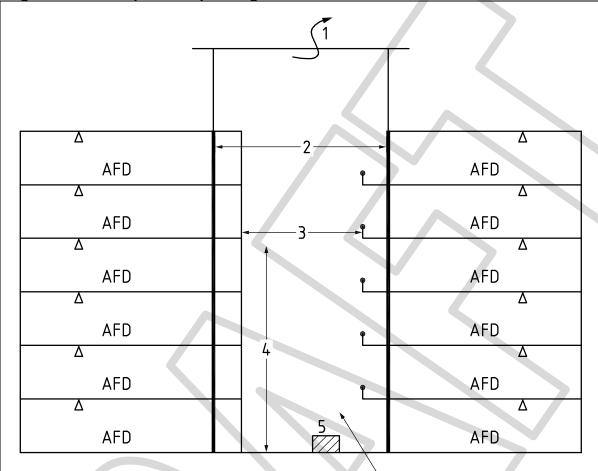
Exemplar 2: Top floor greater than 11 m
